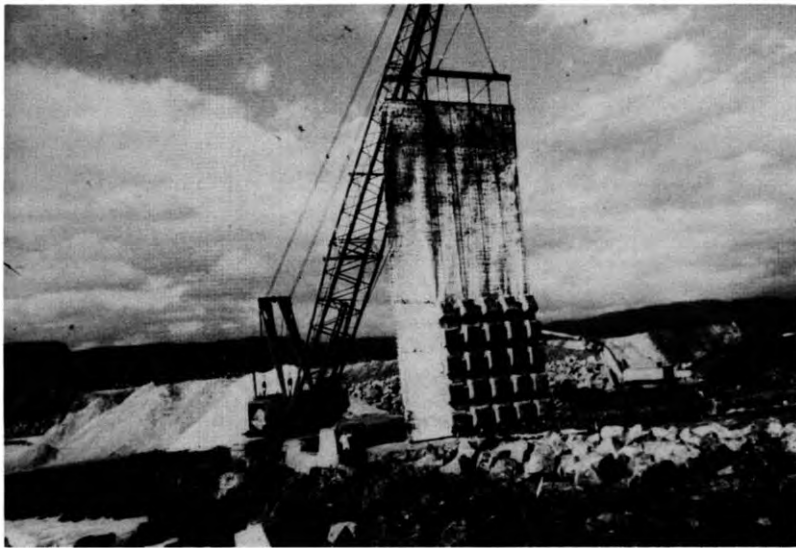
Port Kembla Seawall, Australia: fabric and concrete block mat installation.
